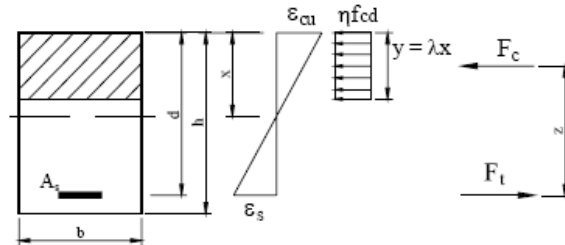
Rectangular section with rectangular concrete stress diagram
